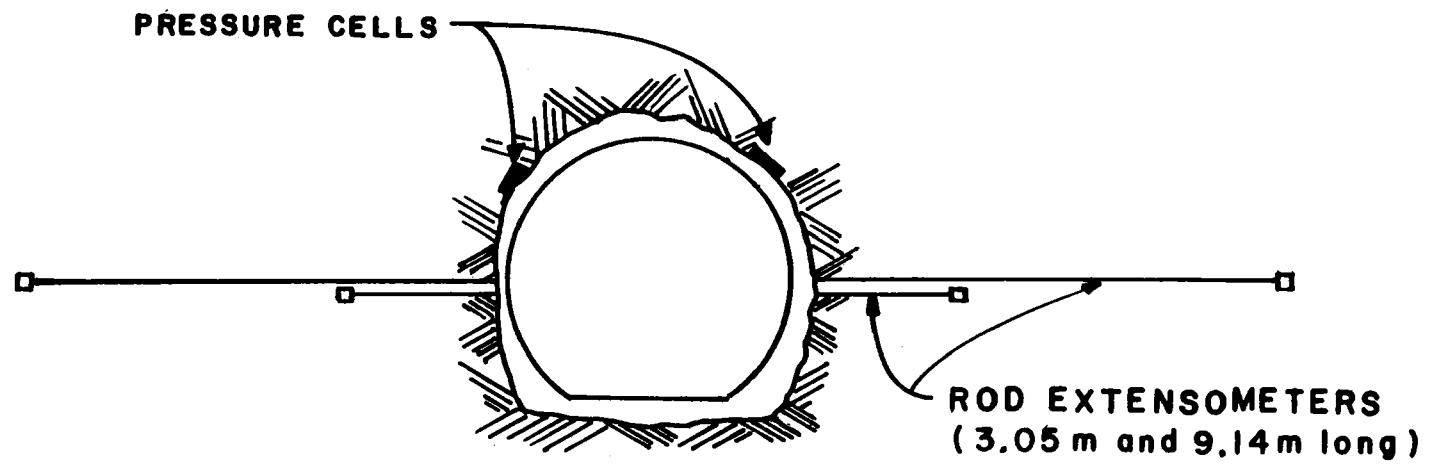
Instrumentation arrangement at Station 1202+77, C2 tunnel.
